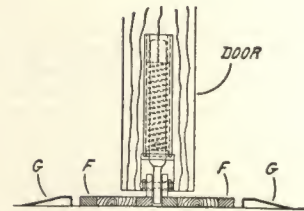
Vertical Cross-Section showing No. 739 Floor Guide and Track illustrated on page 30.
